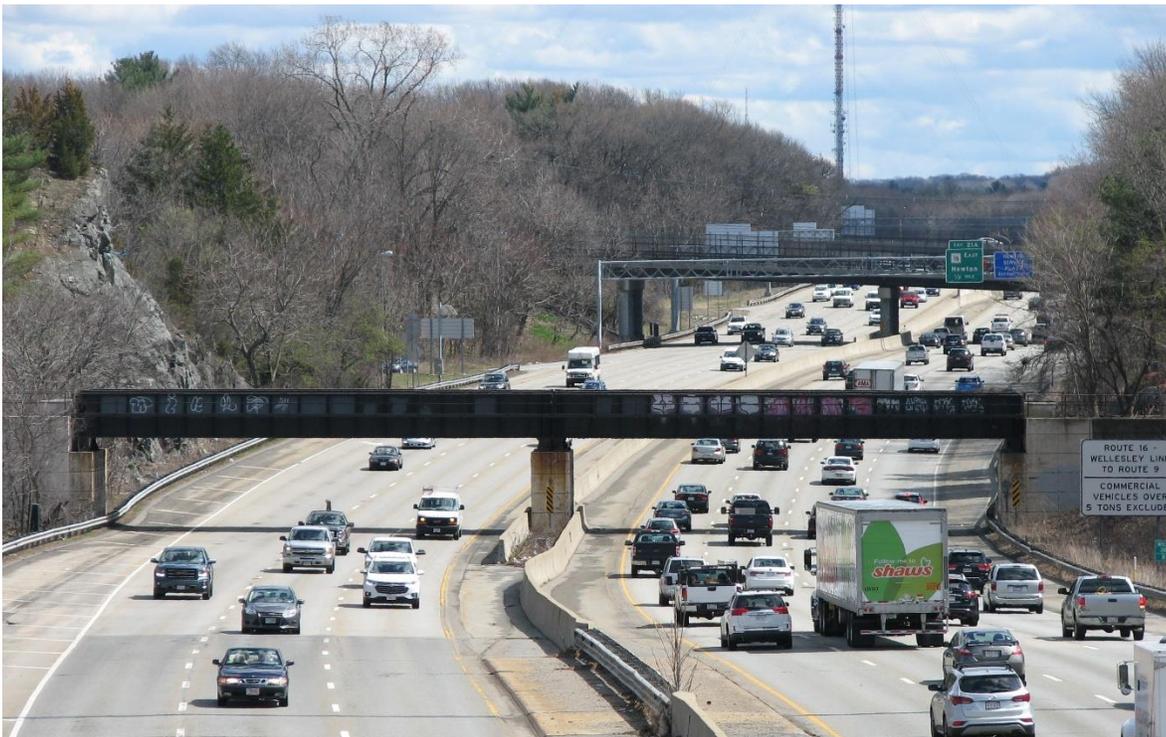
Bridge No. N-12-061 (891) South Elevation
